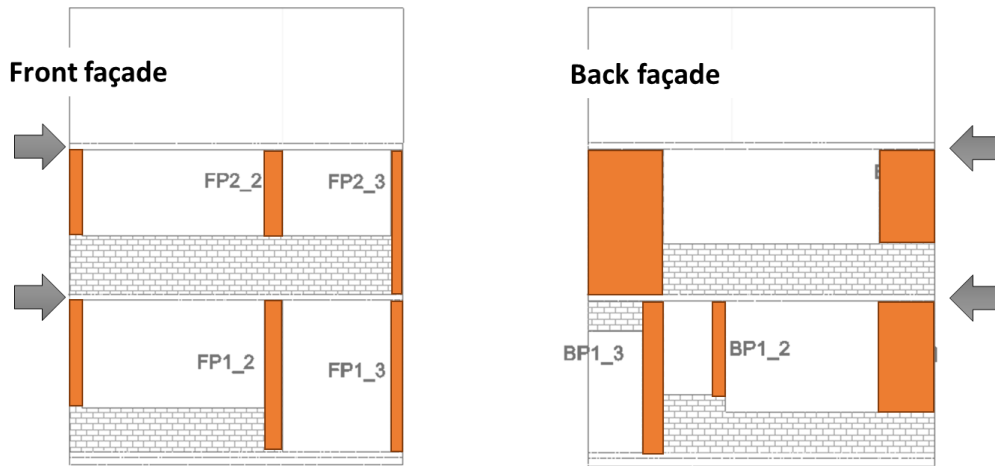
Piers defined on the front and back façades of Building C for positive loading.
